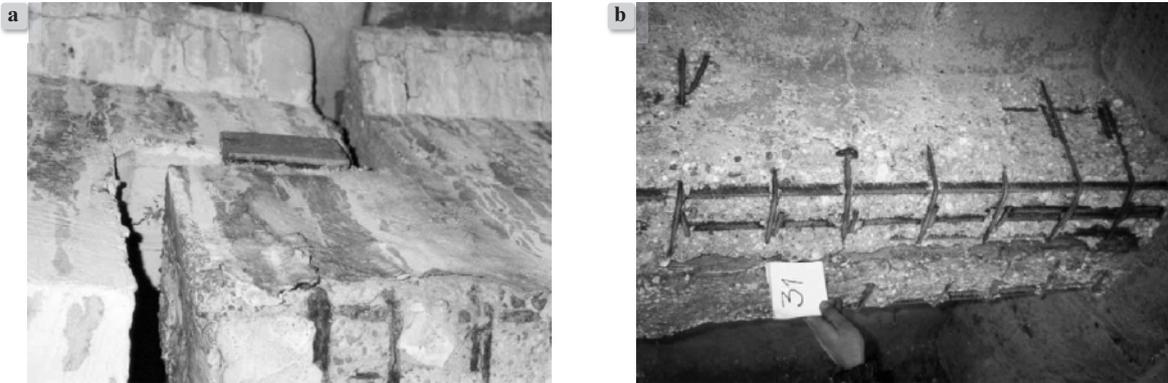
Corroded reinforced concrete elements from Ferenc Puskás Sports Stadium – a) mushy concrete, b) exhibited steel bars [4]
